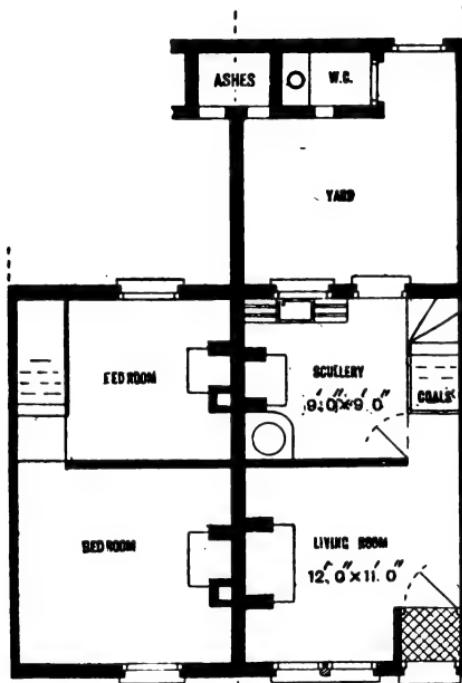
Plan of Ground and First Floor of 12-ft. 9-in. House.
